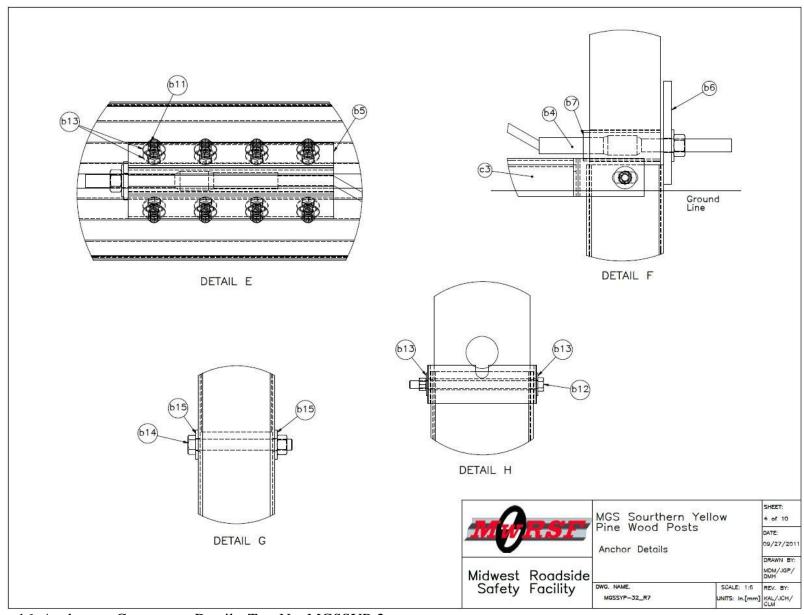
Anchorage Component Details, Test No. MGSSYP-2
